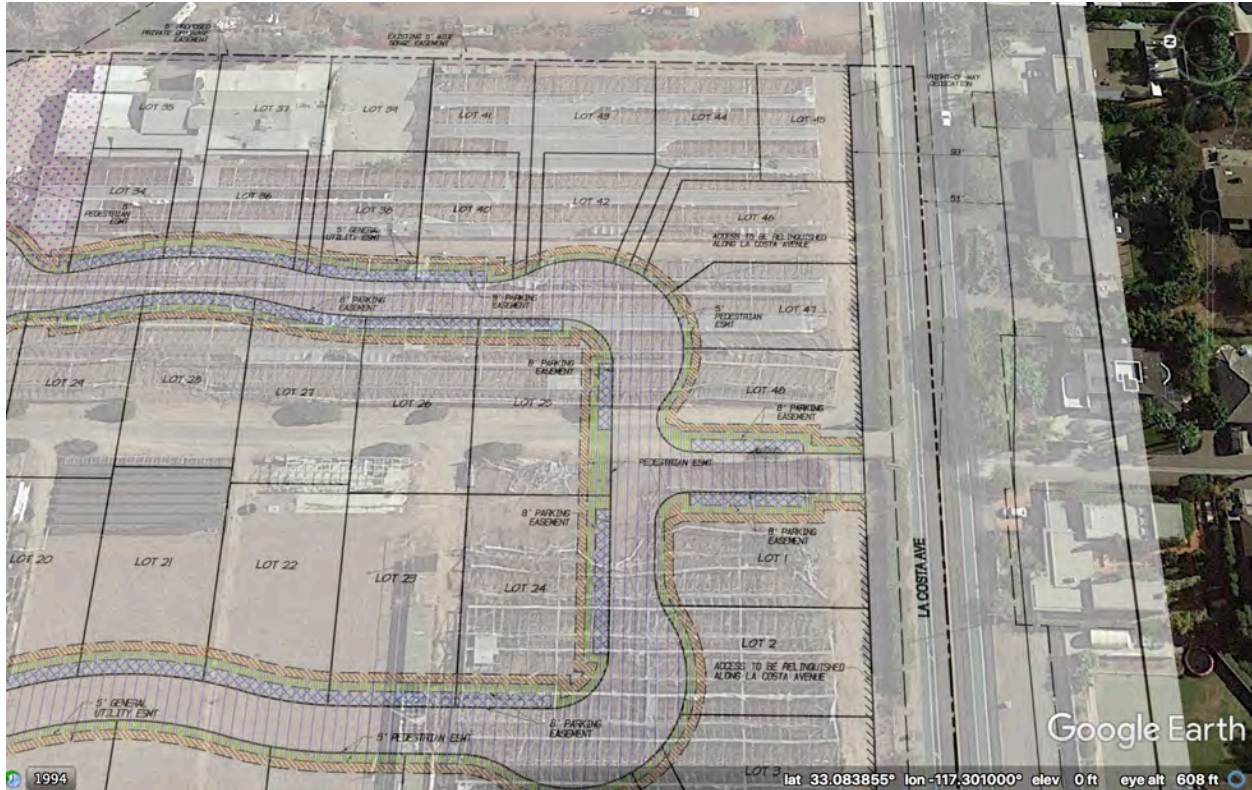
Detail of site plan overlay showing that gross acreage of the project site includes half of La Costa Avenue, and a new private roadway with parking and sidewalks.
